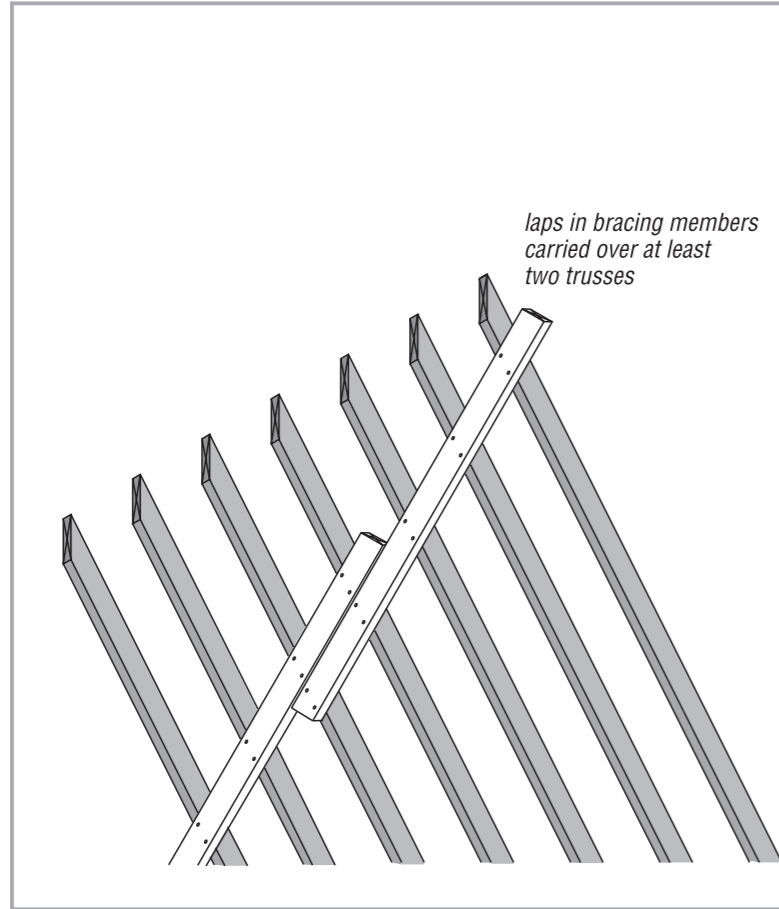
Prefabricated Roof Trusses - additional bracing
